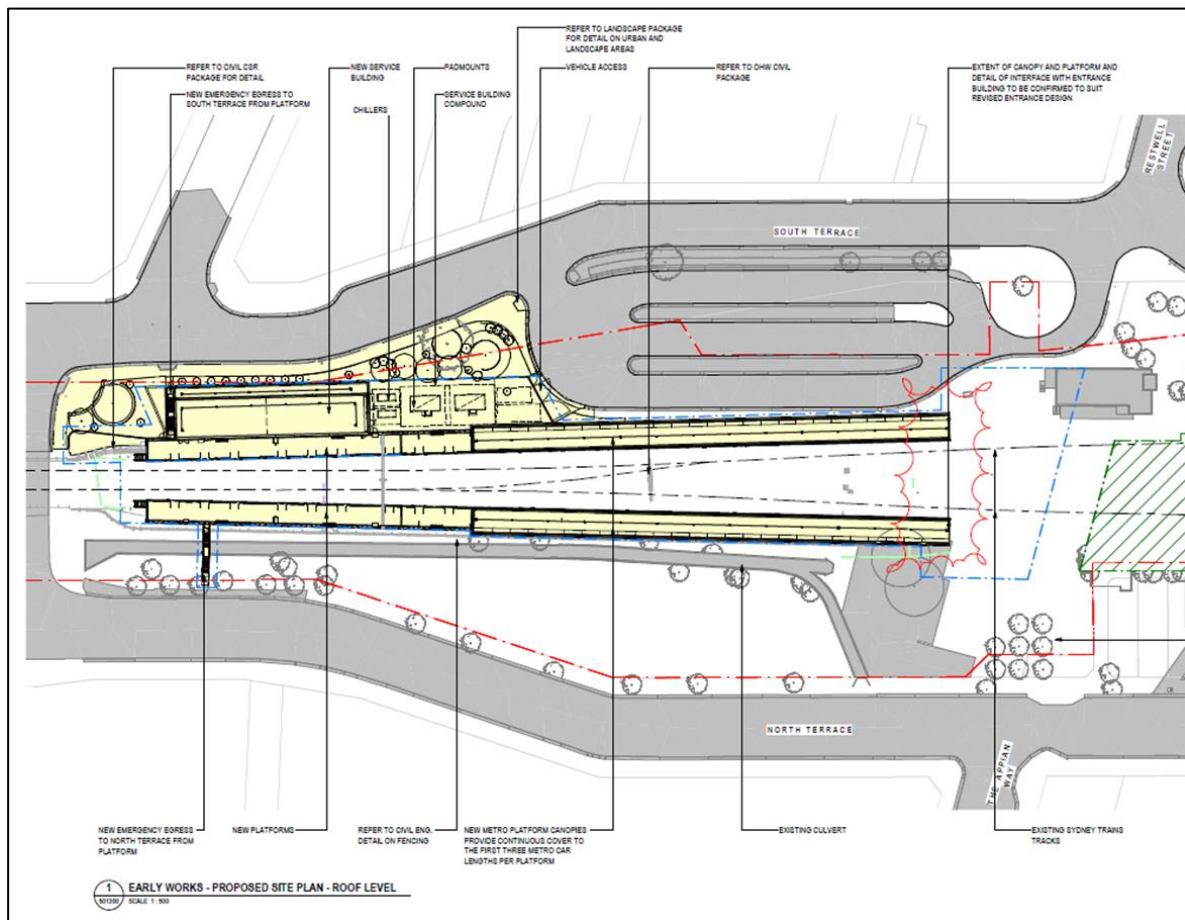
Bankstown Early Works scope (source: Metro T2M – Bankstown Station Design & Precinct Plan – Sydney Metro Southwest Metro Design Services, 2021)
